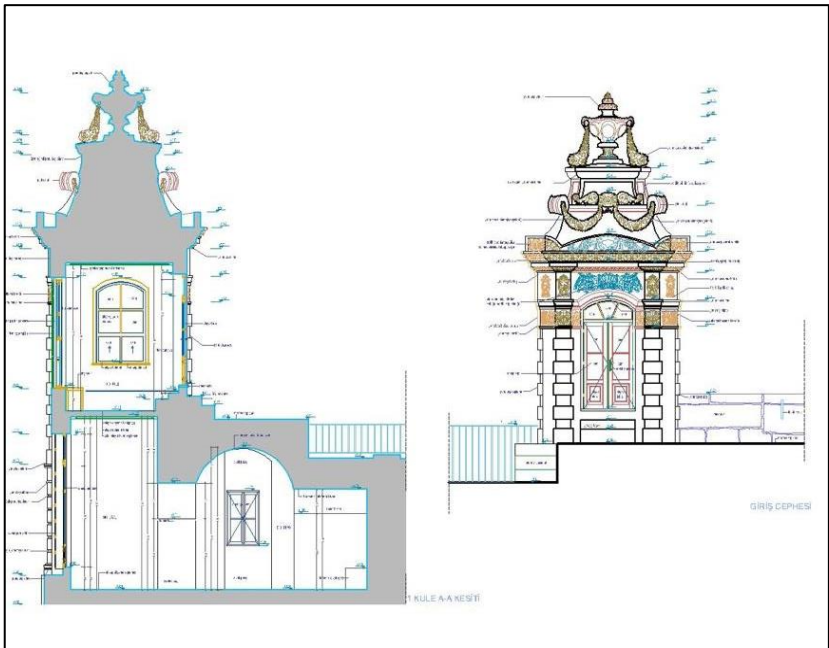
Tower Cone and Facade Restitution Drawing (Author Archive, Bimtaş 2009)
